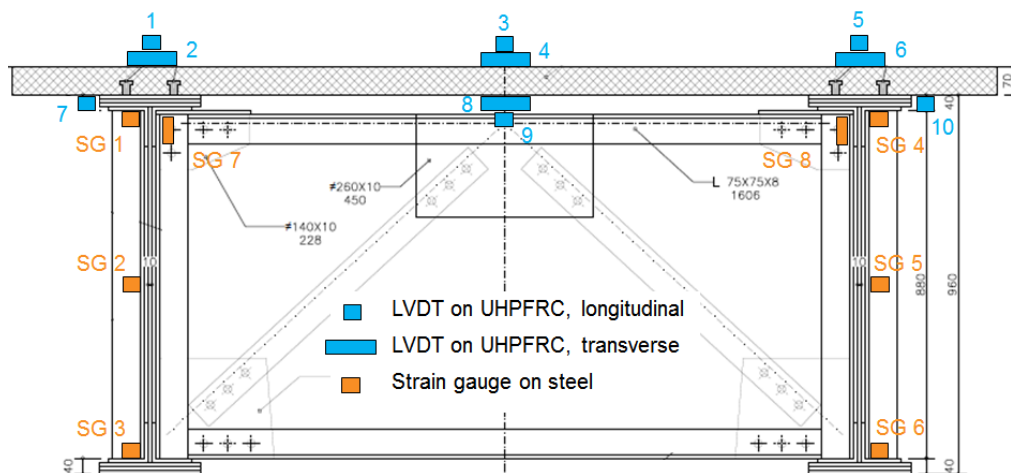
Static tests – LVDTs and strain gauges on steel and concrete placed in sections A, B and C (SG 7 & SG 8 were placed only in cross section B)
